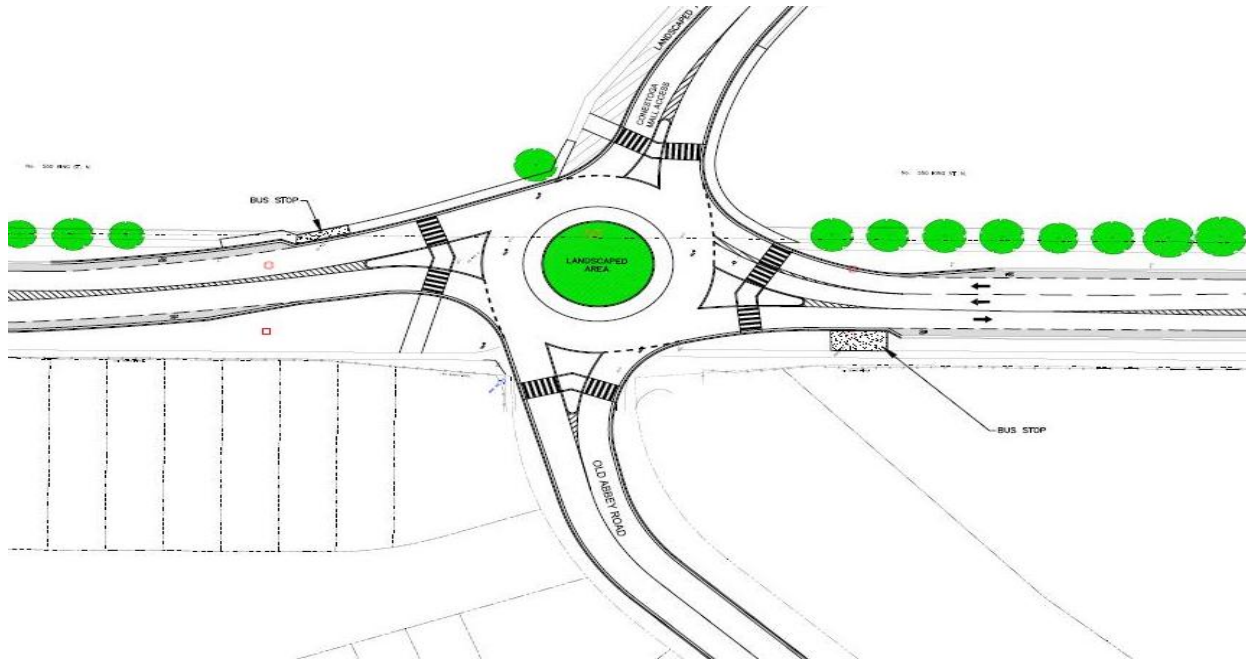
a draft layout of the roundabout for the Davenport Rd and Old Abbey Road intersection
